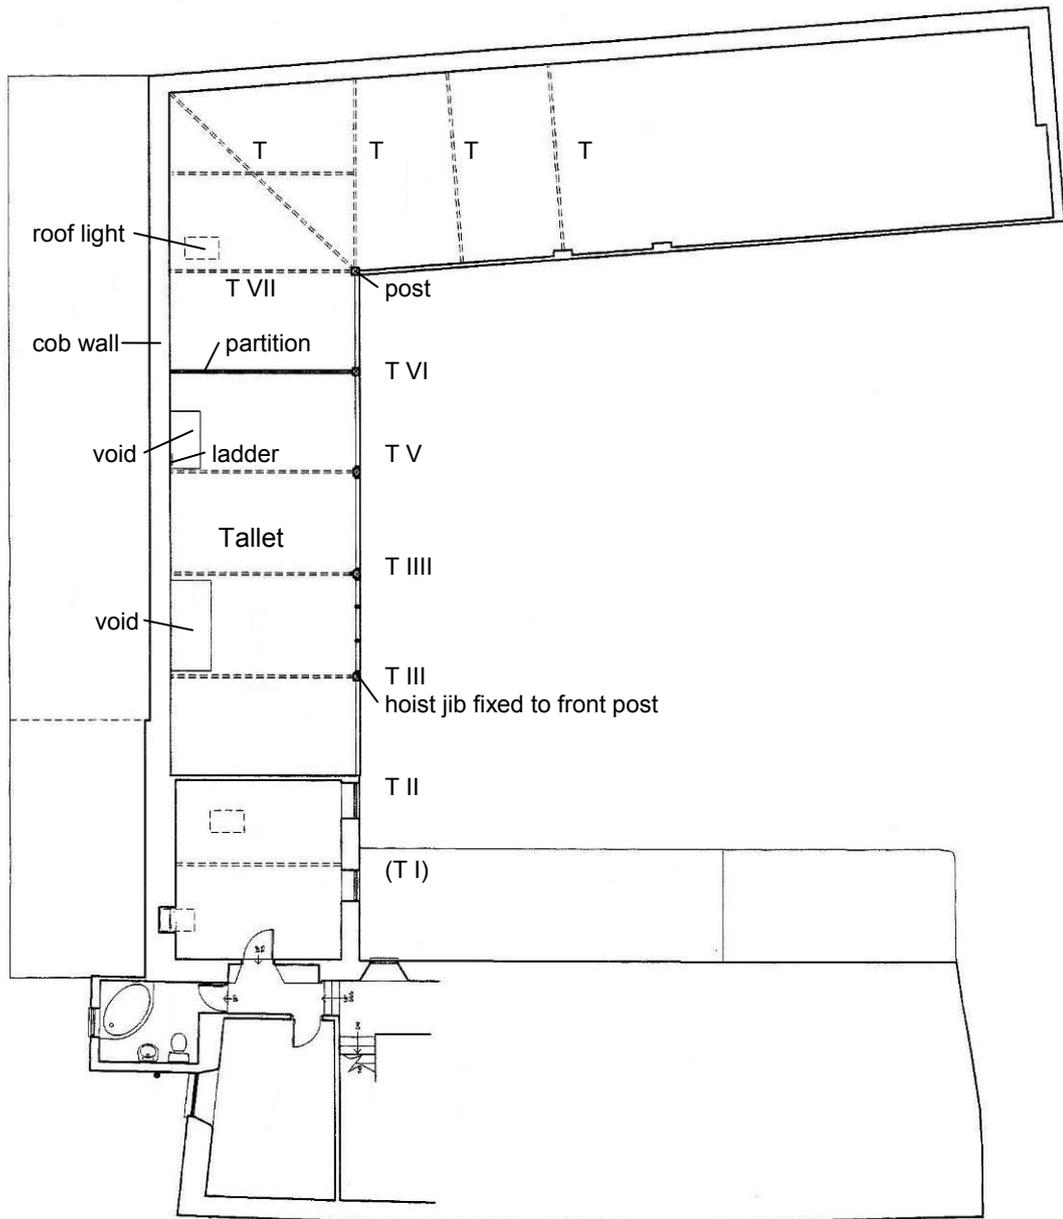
Woodhayes Farm, Clyst Hydon. First floor plan of linhay
